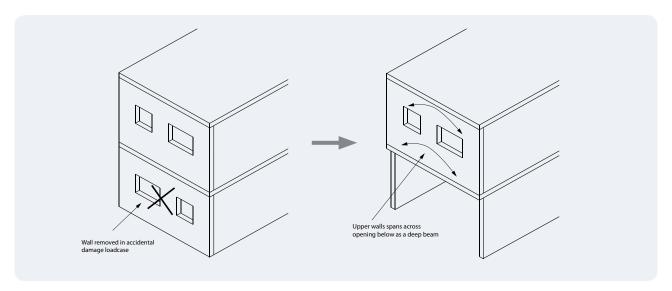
Spanning of walls in accidental damage load cases. (from WoodSolutions Technical Design Guide #39 Robustness in Structures)
